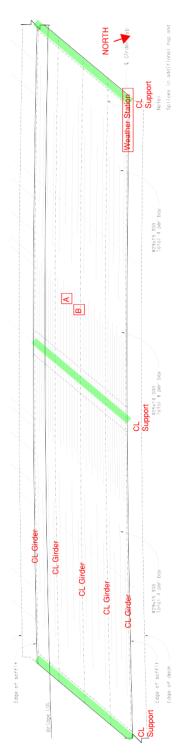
Instrument Location Designations at the Markham Ravine Bridge.
